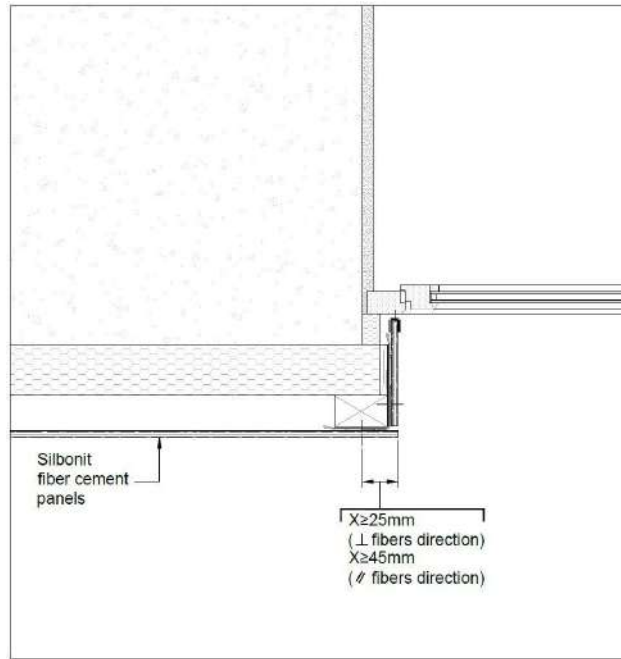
Example of horizontal section of a ventilated facade along a window. Wooden subframe.
